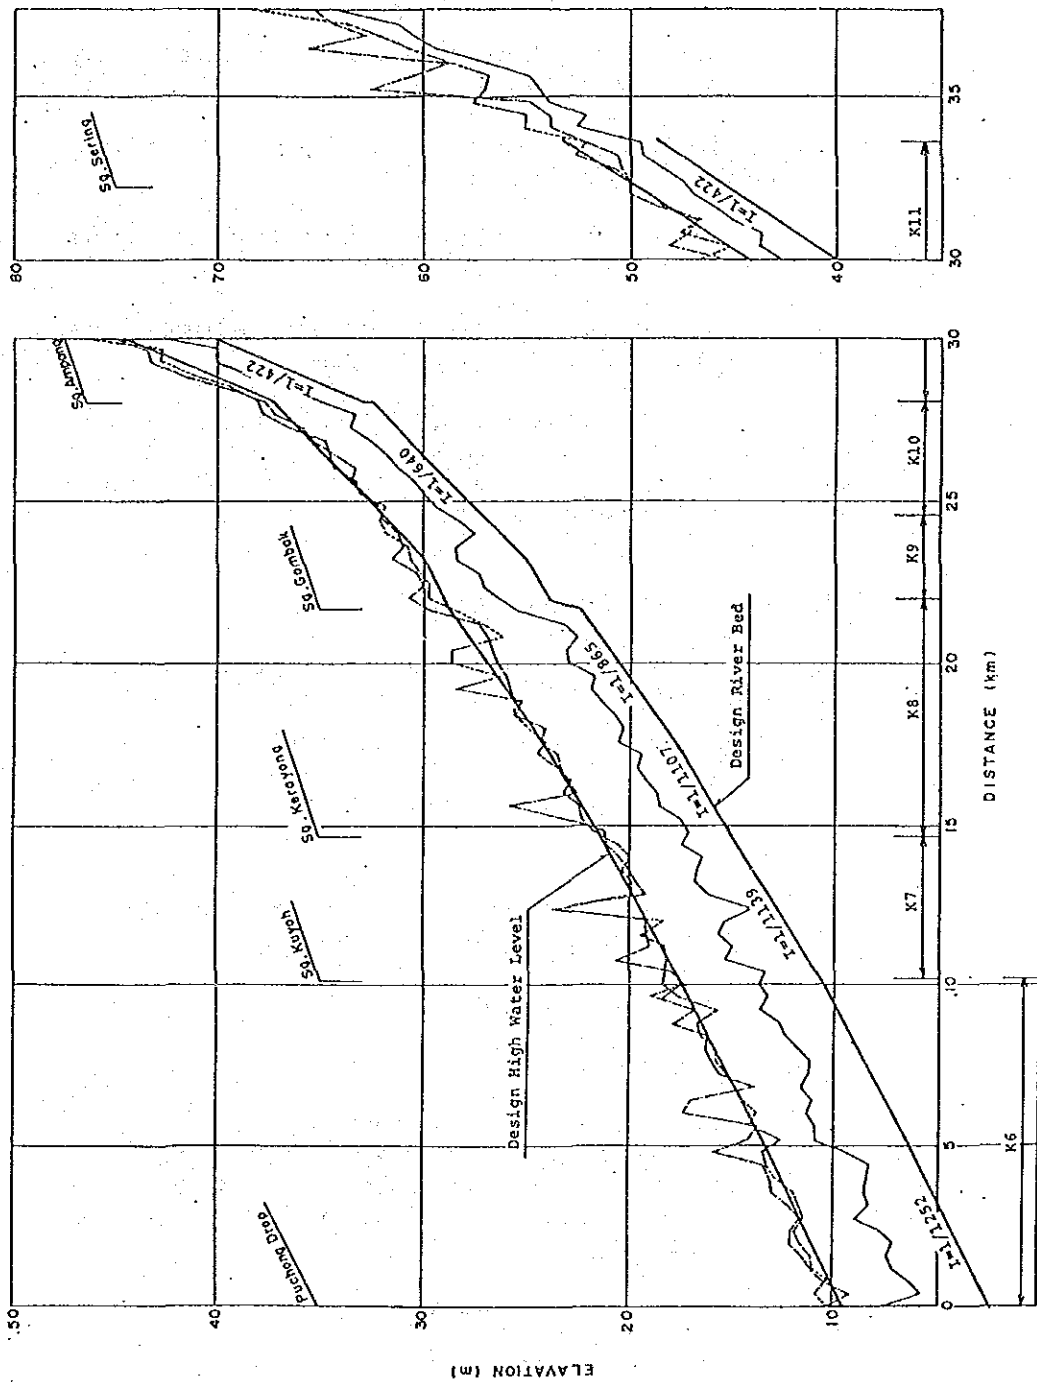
PLANNED LONGITUDINAL PROFILE OF SG. KLANG .2
